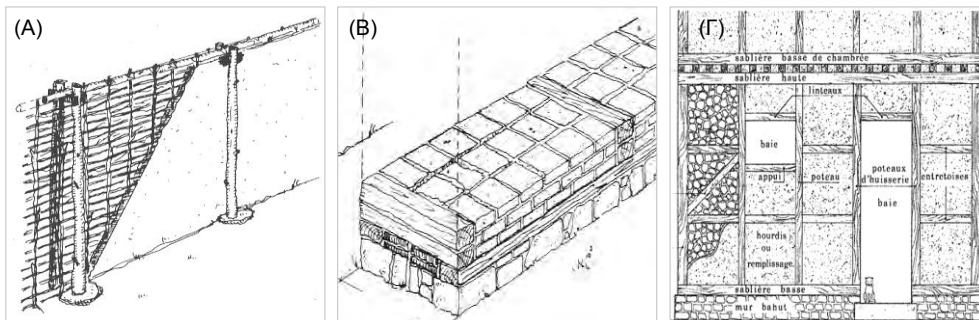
(A) Early form of timber weaved walls [9], (B) Stone masonry timber laced walls [9], (C) Timber laced walls [1].
